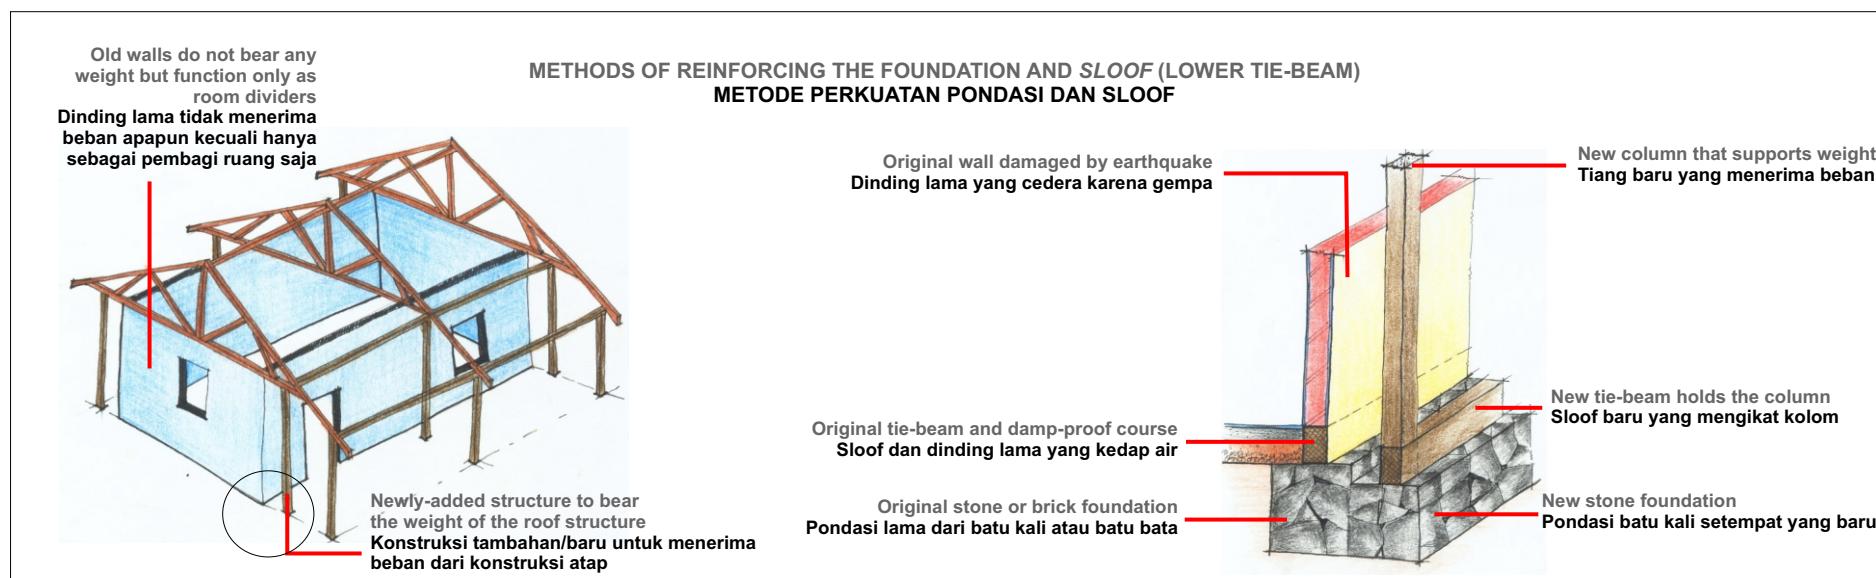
Methods of reinforcing the foundation and *sloof* (lower tie-beam)
